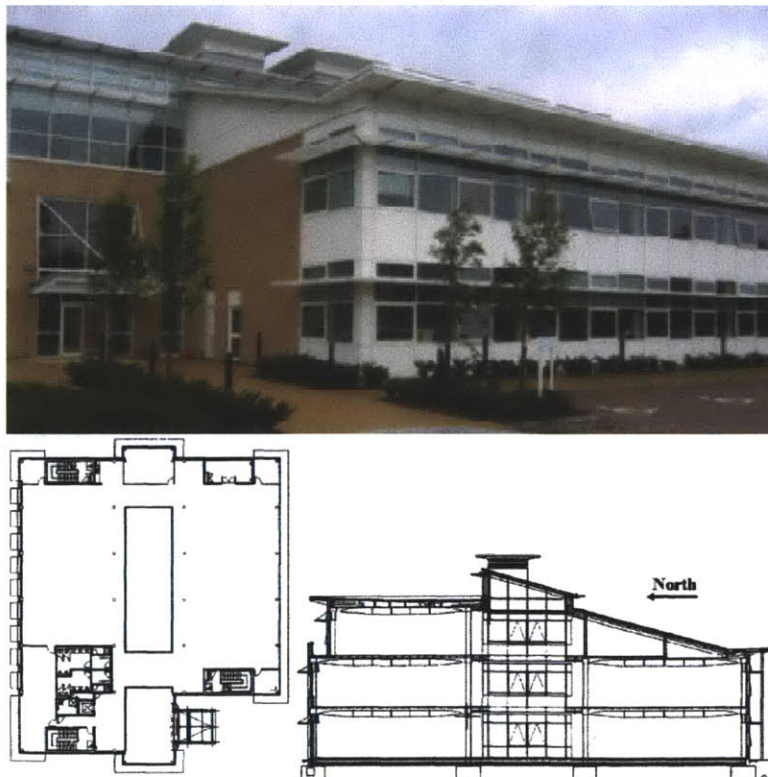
Photograph of the Houghton Building, a three story office building in Luton, UK, with plan and section drawings. [61]
